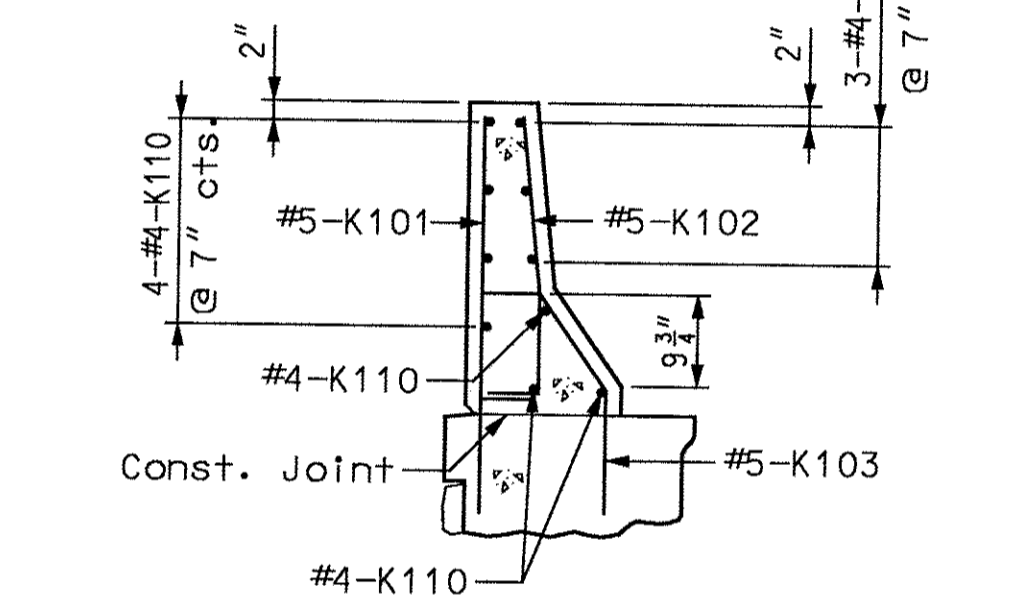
DETAILS OF SAFETY BARRIER CURB AT END BENTS
